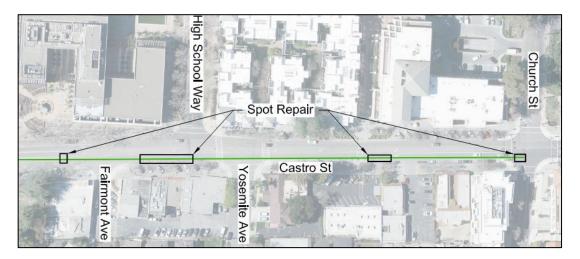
Castro Street—South of Fairmont Avenue to Church Street
